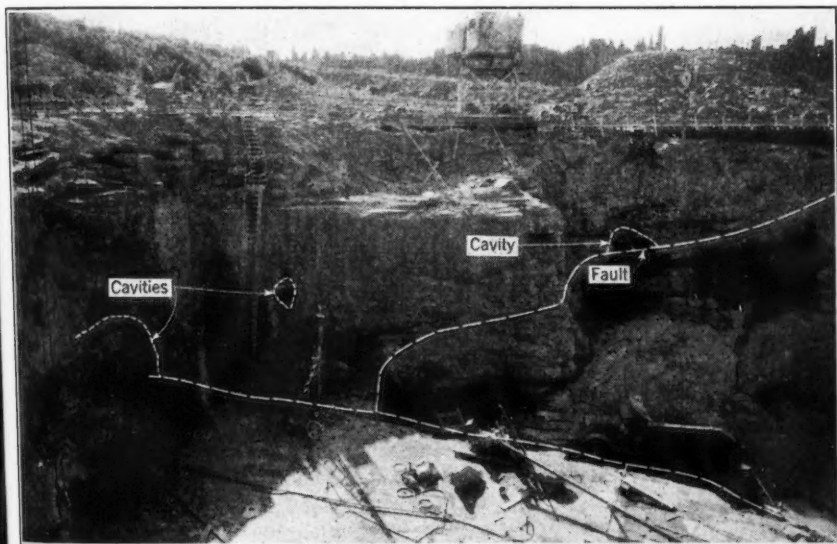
POWER-HOUSE EXCAVATION, SHOWING FAULT AND CAVITIES IN UPPER TRENTON LIMESTONE
